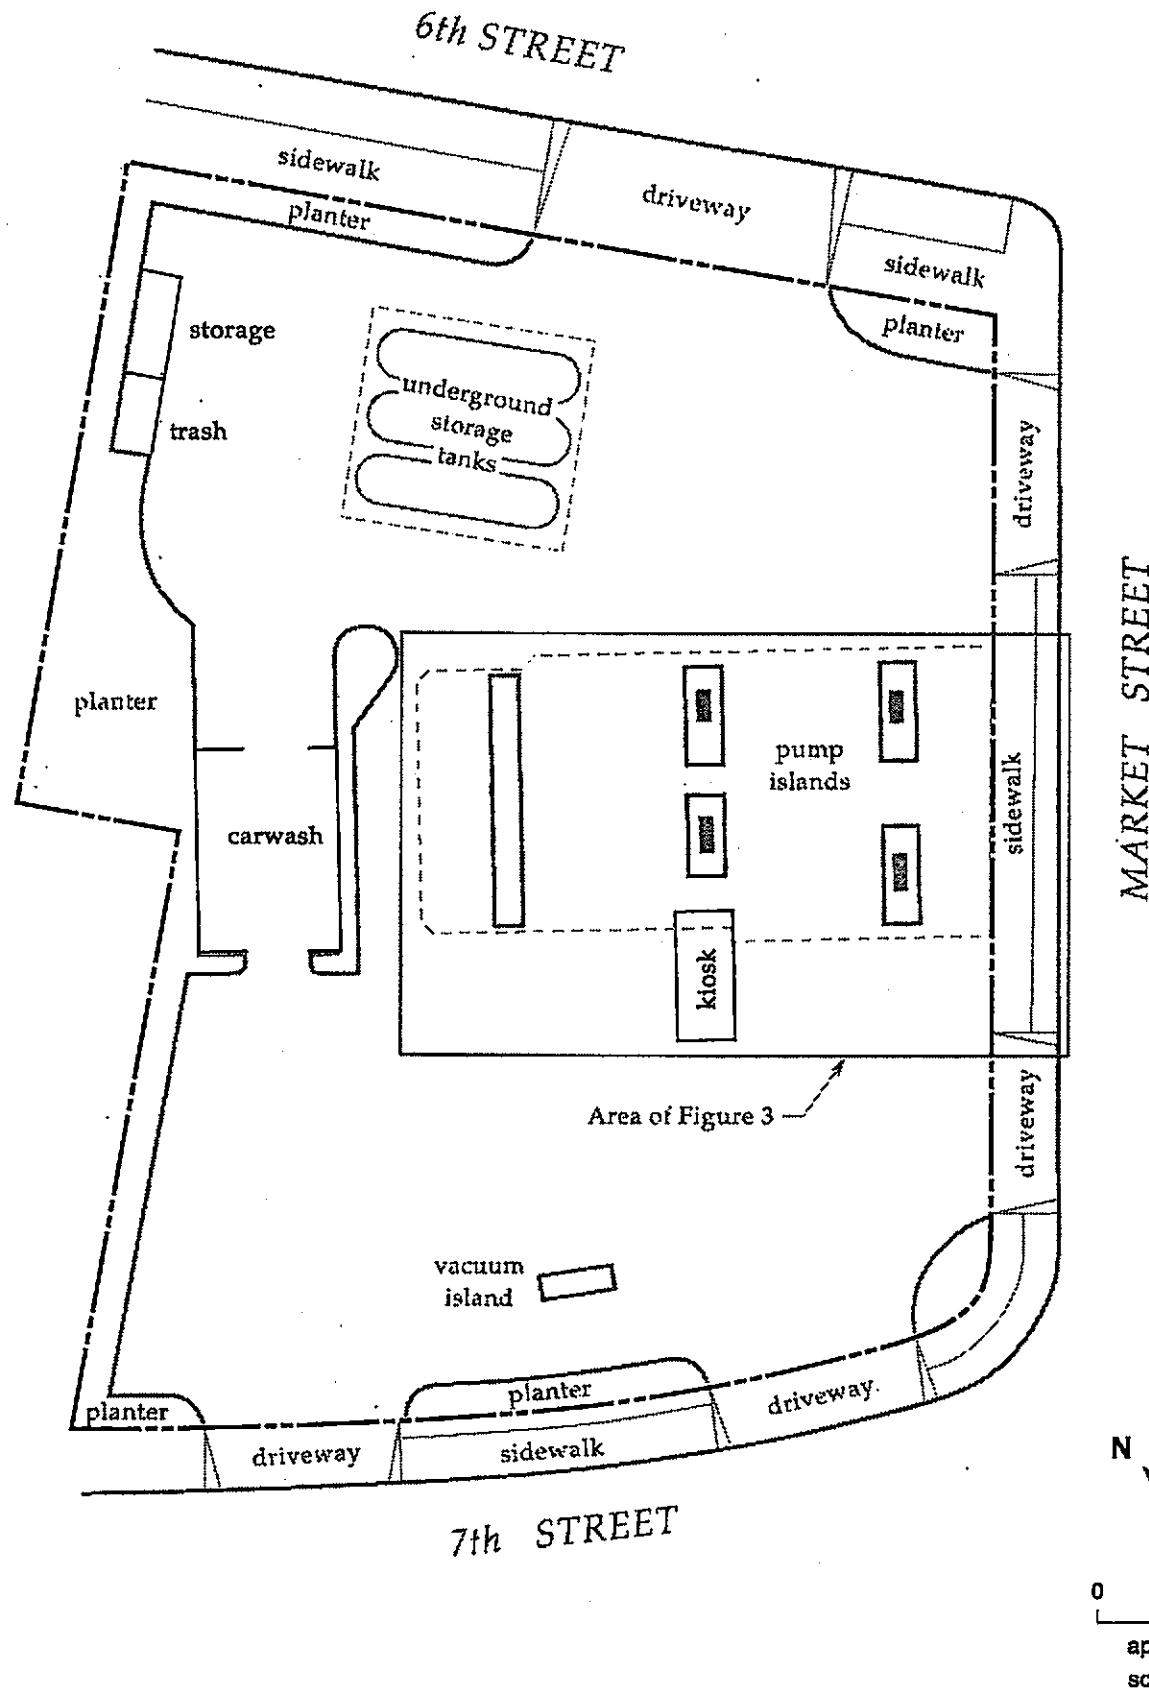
Site Layout - Shell Service Station WIC# 204-5508-5702, 610 Market Street, Oakland, California
